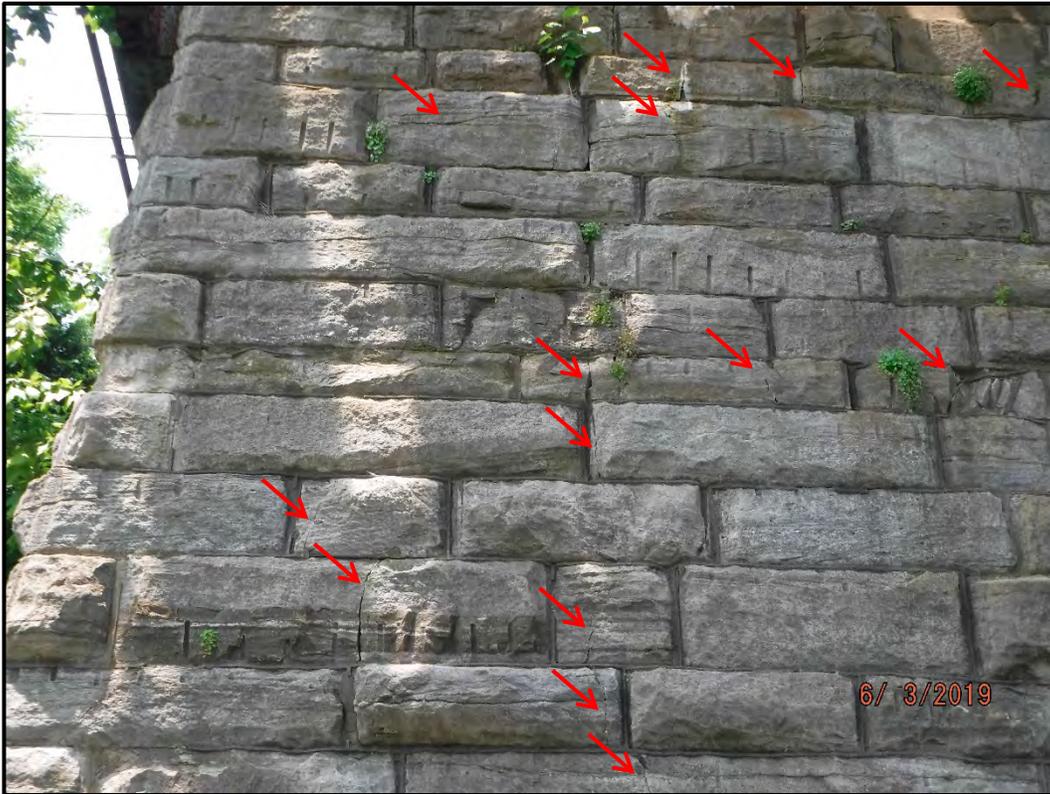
Minor cracking throughout the south end of the Pier 6 east face.
